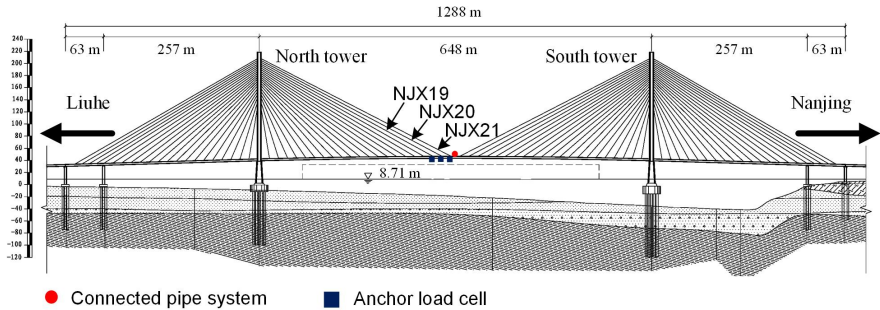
Configuration and sensor layout of the Nanjing Dashengguan Yangtze River Bridge.
